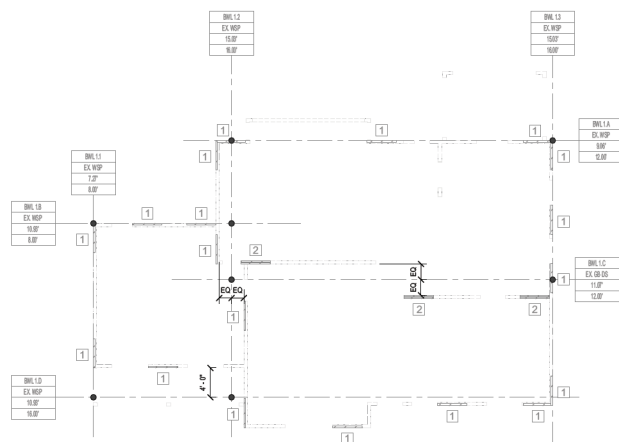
illustrates a building layout with a central corridor and multiple rooms. The layout is symmetrical around a central vertical corridor. The rooms are labeled with their IDs and dimensions. The layout is as follows:
